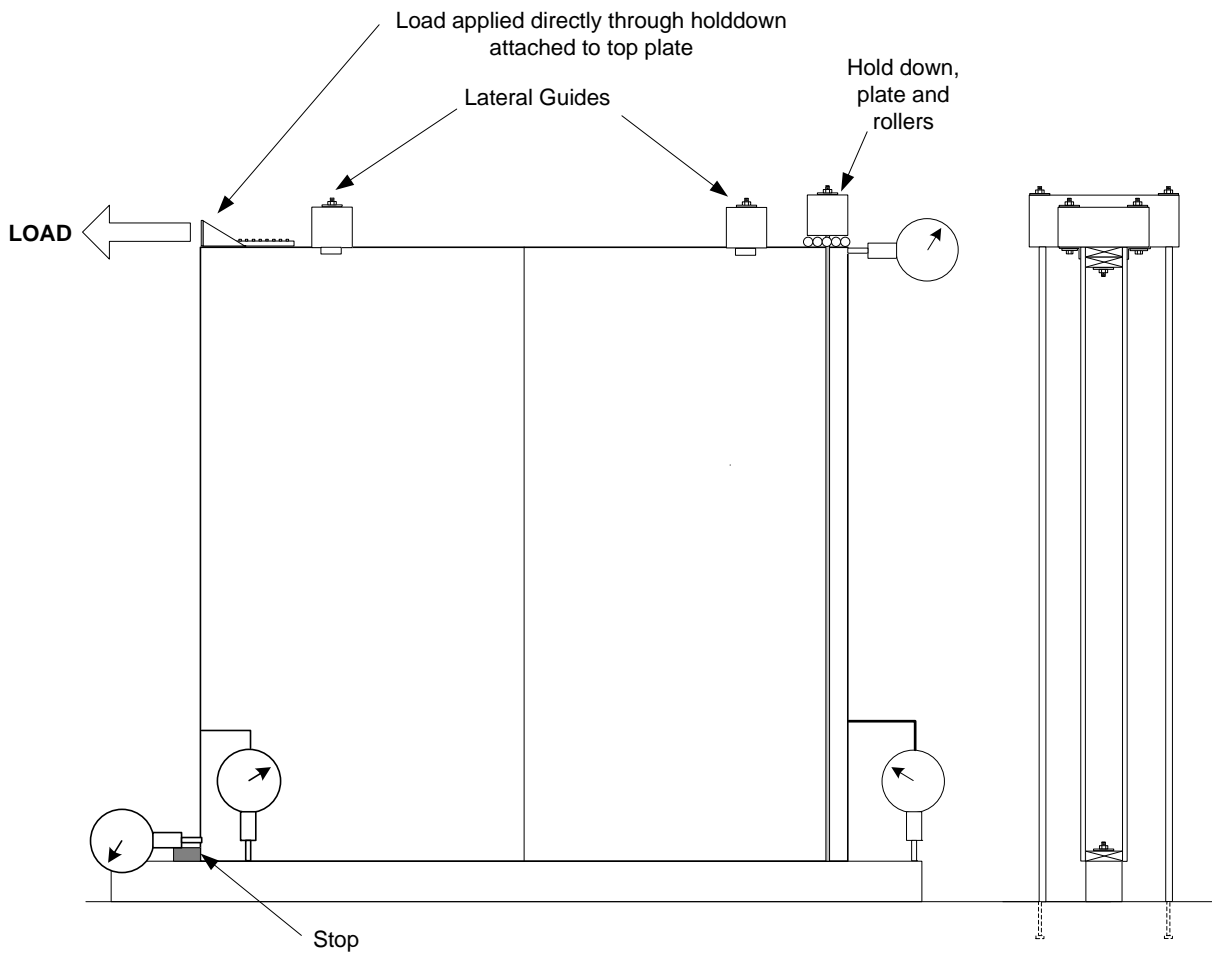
RACKING SHEAR TEST ASSEMBLY
